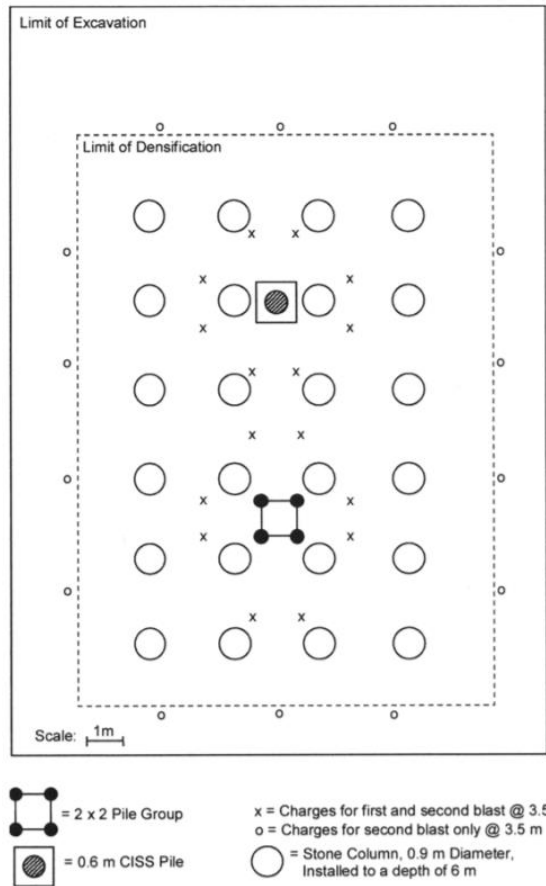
Plan View of Stone Column Placement and Test Set-Up (Rollins et al. 2000)
